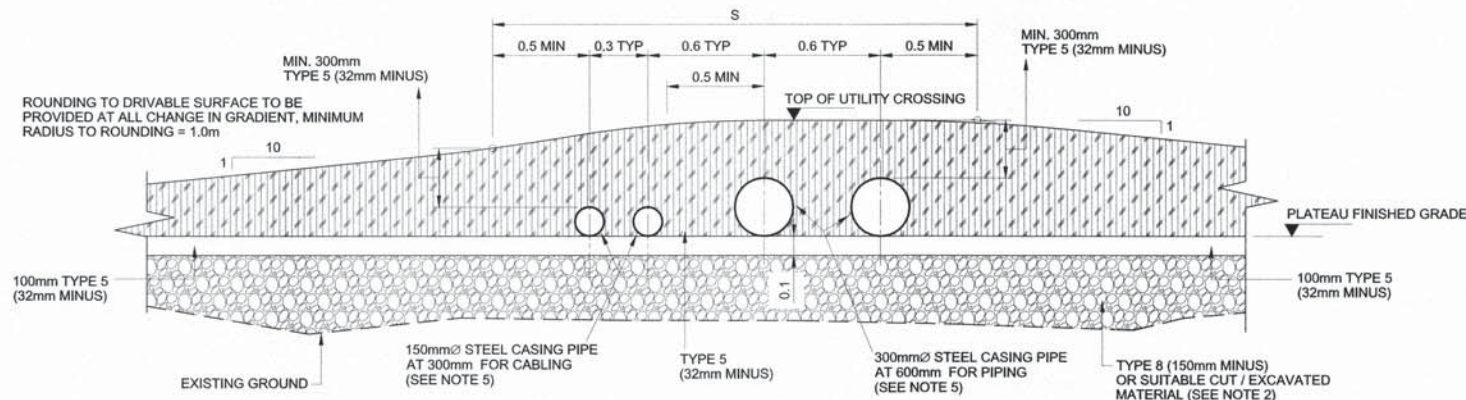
UTILITY BERM ON EXISTING GROUND
